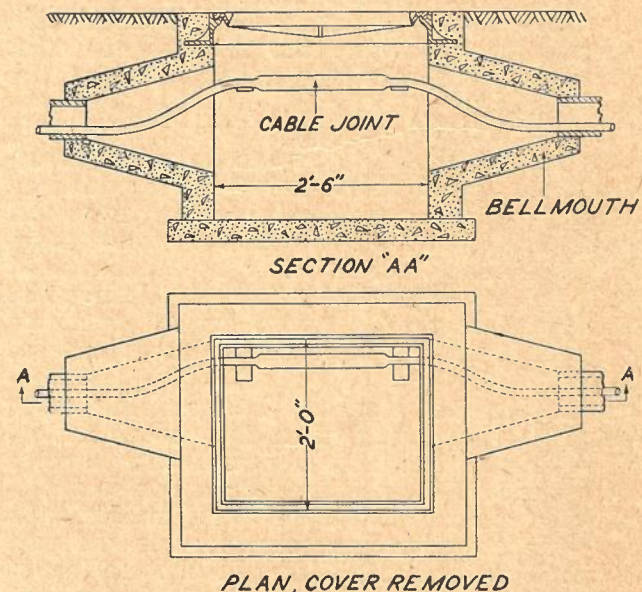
Joint Box Footway—Single Cover. (Drainage details omitted.)
